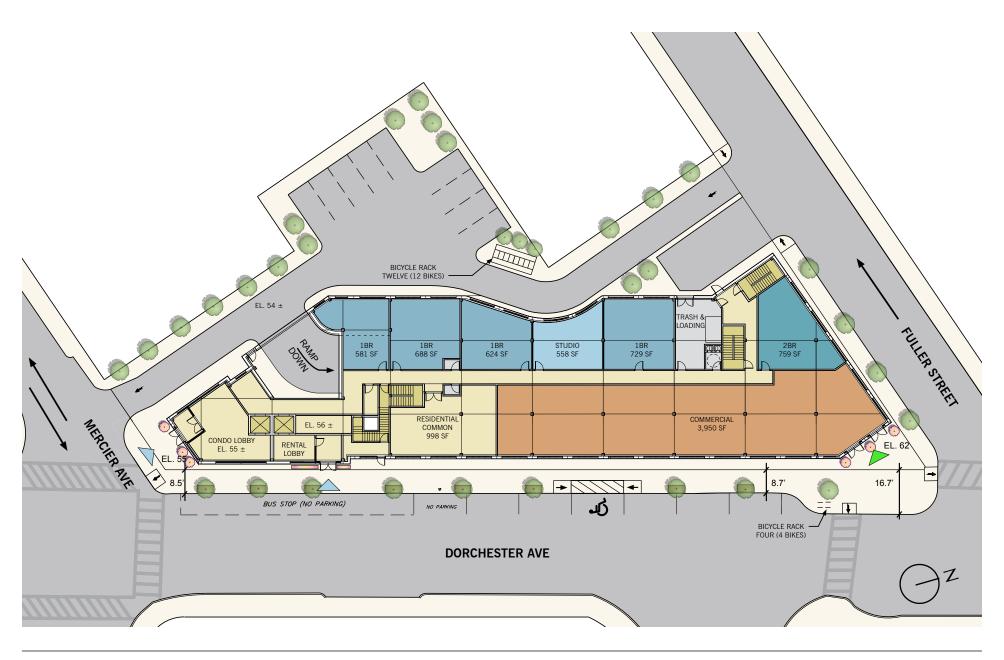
Ground Floor Plan Source: The Architectural Team, Inc., 2014
